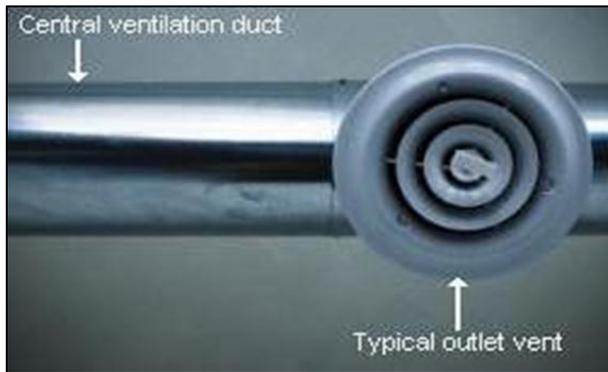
Ventilation duct with outlet diffuser vent. These are installed throughout a building to move air in or out of rooms
